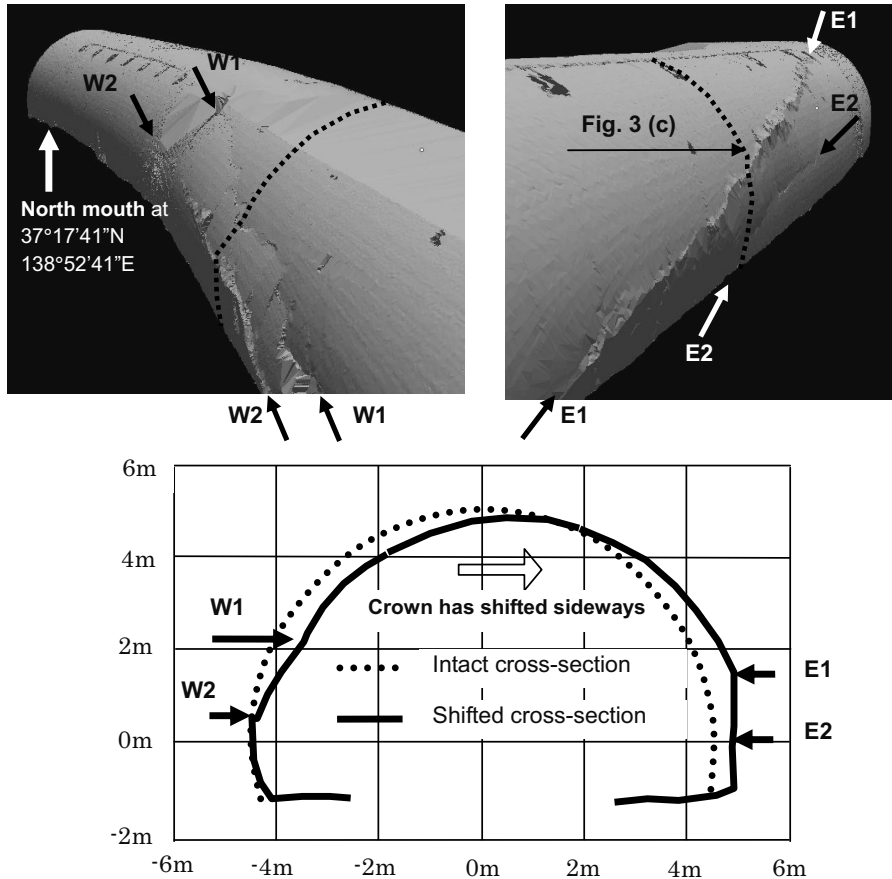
North segment of Kizawa tunnel. (a) West tunnel wall, (b) East tunnel wall, (c) Tunnel cross-section at 59m distance from the north mouth (looking northward) (after Konagai et al., 2009)
